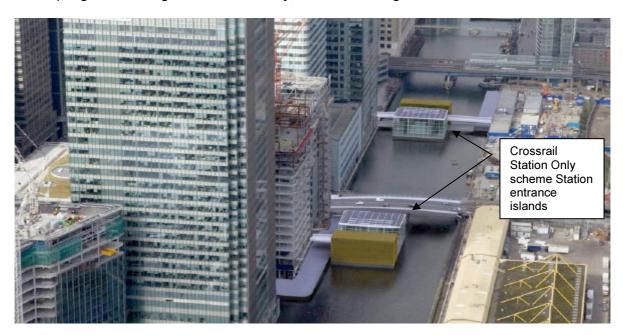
Photo-montage showing the approved station only scheme within the dock
